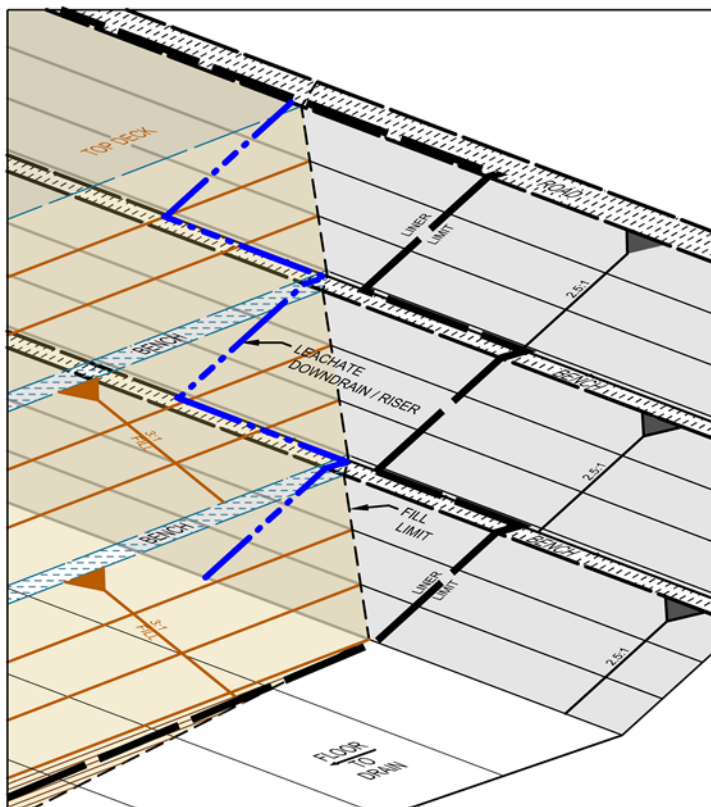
Utilization of Mid-Slope Benches to Divert Drainage
